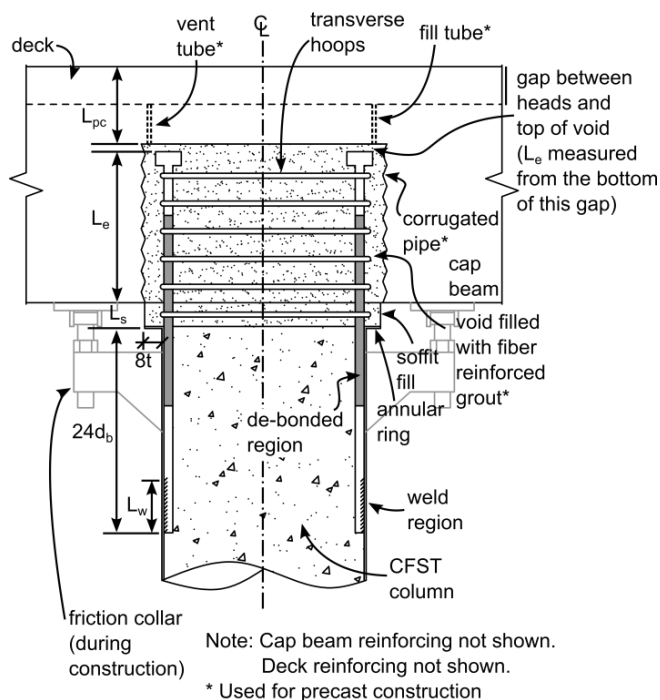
Welded Dowel Connection with De-bonded Reinforcing
